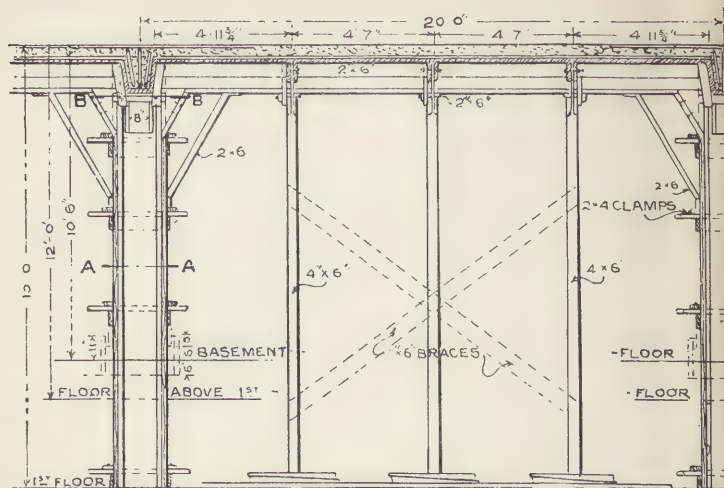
Column, Beam, and Floor Moulds (Elevation).
